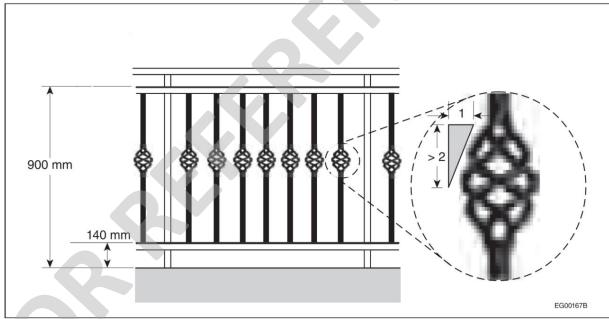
(1)-D Example of guard protrusions with a slope greater than 2 in 1
